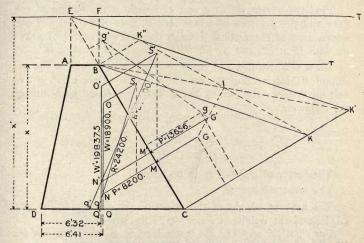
Graphical Solution of the Forces Acting on a Dam.
